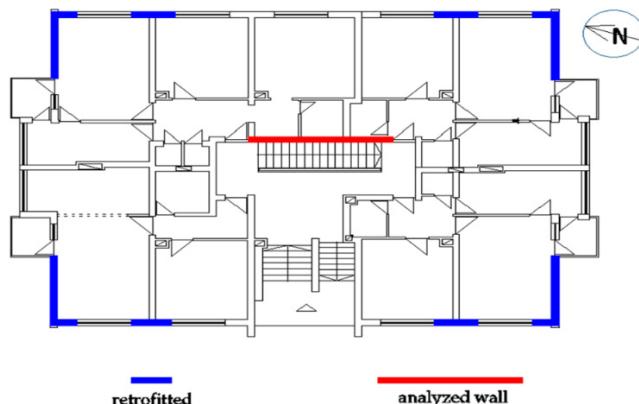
The floor plan showing retrofitted exterior walls (blue color) and the analyzed wall (red color).
